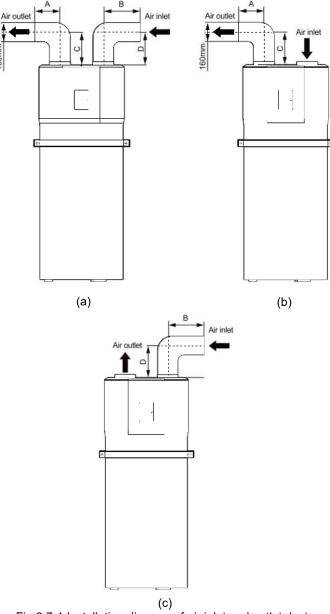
Installation diagram of air inlet and outlet ducts
